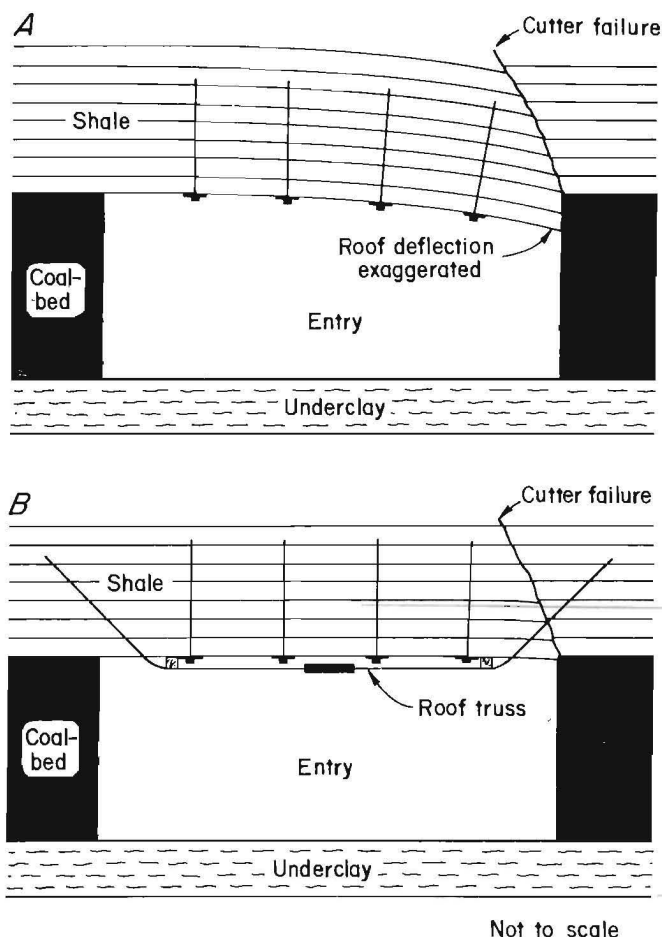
Schematic of roof movement (cantilever beam) before and after installation of roof trusses.
